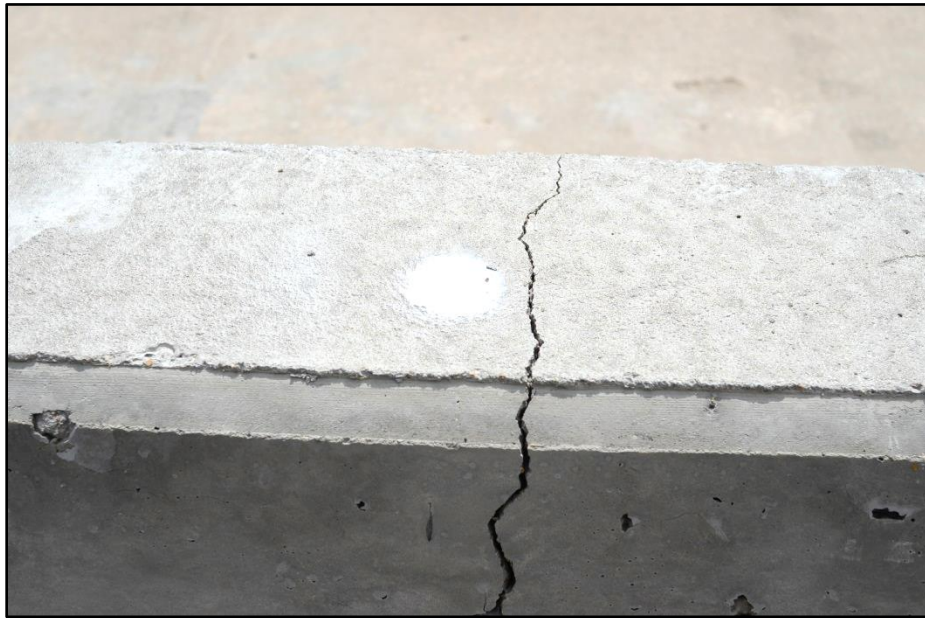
Top of Barrier after Test No. 468957-B8.
